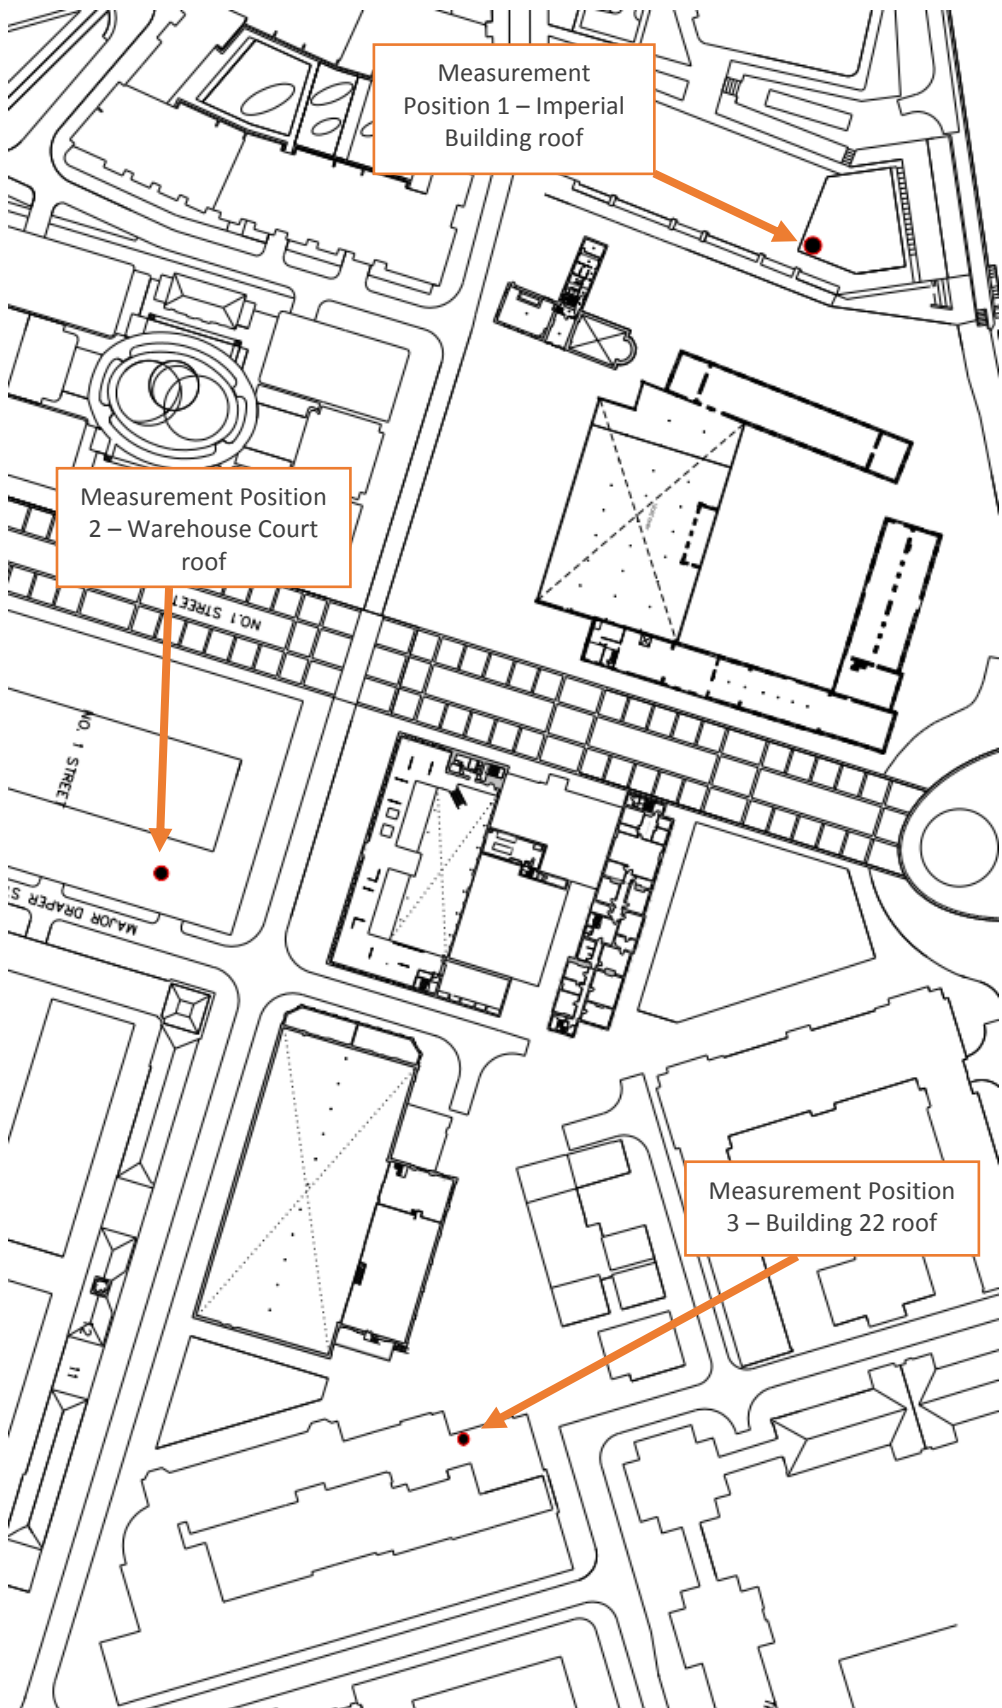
SITE PHOTO OF MEASUREMENT LOCATIONS
